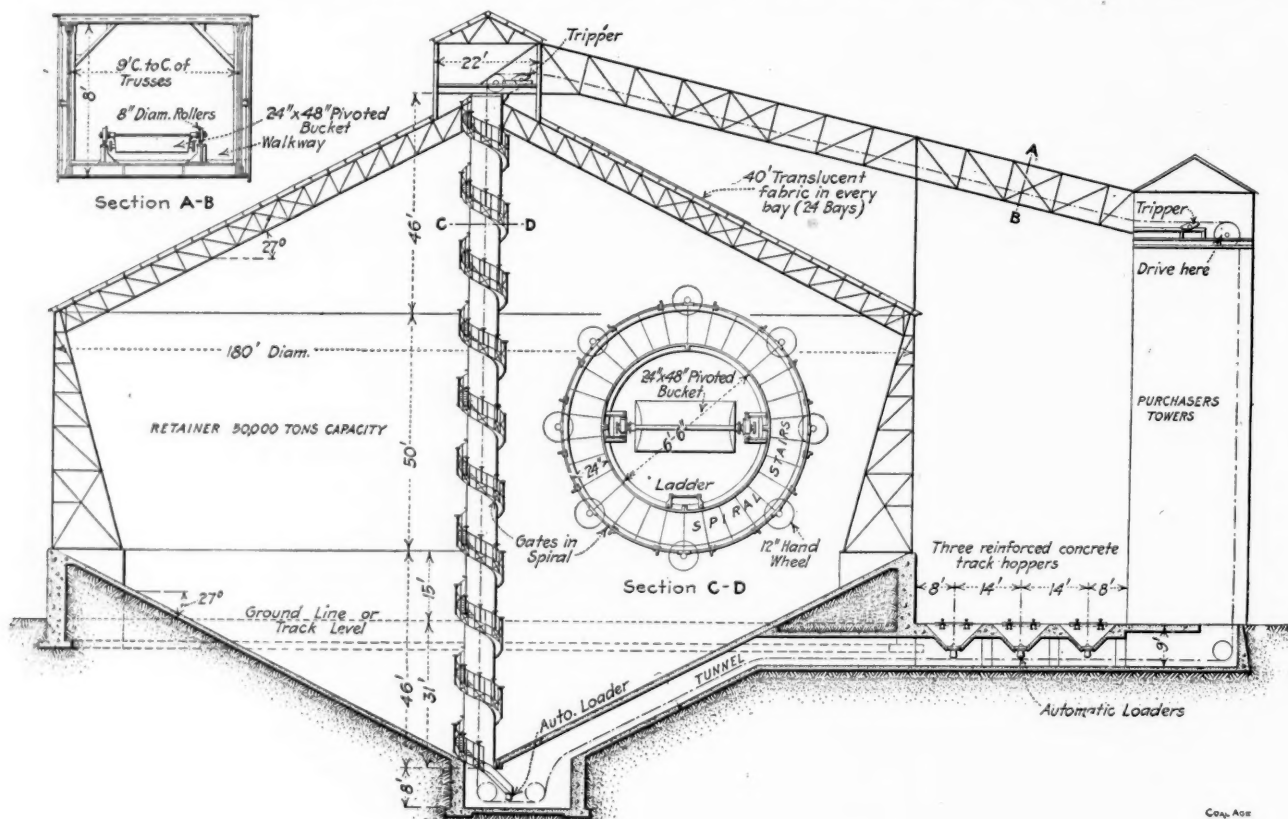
CROSS-SECTION OF A SINGLE UNIT, SHOWING SOME DETAILS
